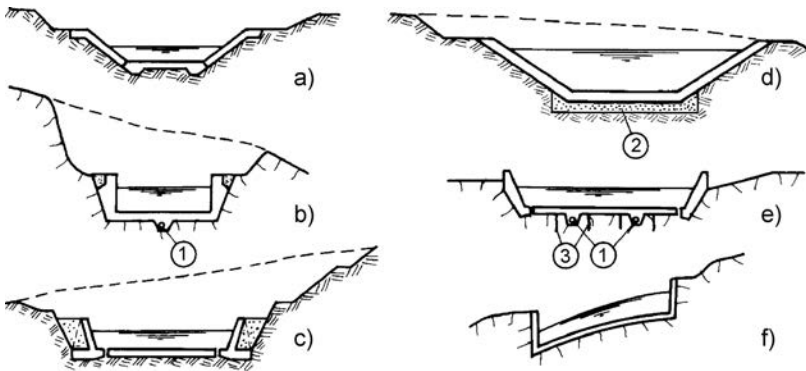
Cross-sections of the spillway chute (after Grishin et al., 1979). (a, c, d) In the case of a soil foundation; (b, e, f) in the case of a rock foundation. (1) Drainage; (2) drainage layer of sand; (3) anchors.
